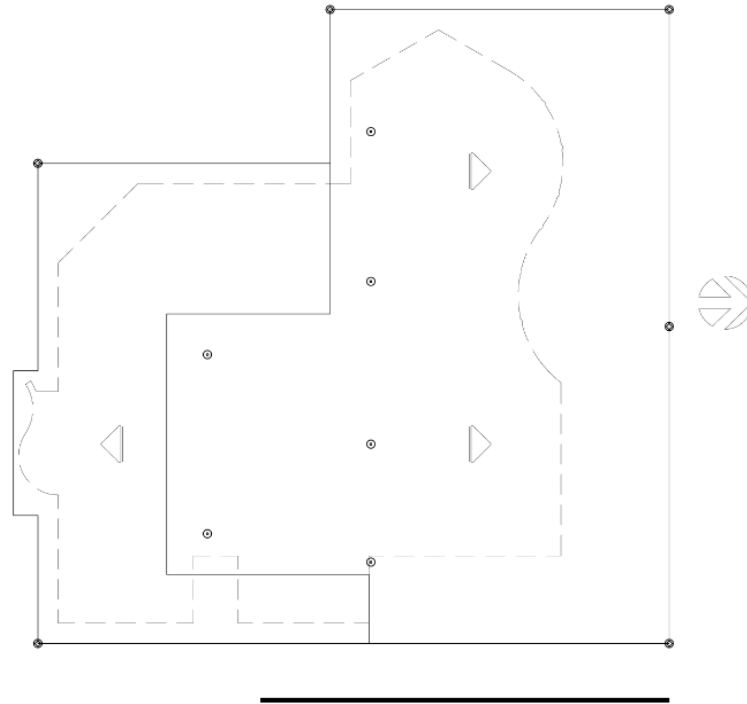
Roof plan (solid line) of a single-family house designed for the installation of an experimental tropical greenroof technique, which consists of three layers: Thin geotextile, waterproofing membrane and thick geotextile. Arrows indicate directions of water flow and dashed lines indicate external walls. Roof total area is 250 m². Irrigation sprinkler positions are indicated by ☼ and ☼. Project was installed at Niterói municipality, Rio de Janeiro State, Brazil in December 2012
